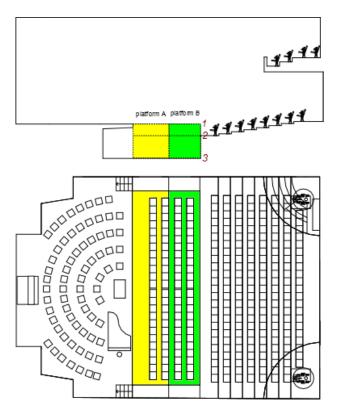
Cross-section and plan view of the concert hall, showing the possible positions (level 1, 2 and 3) of the two lifting platforms, A and B.
